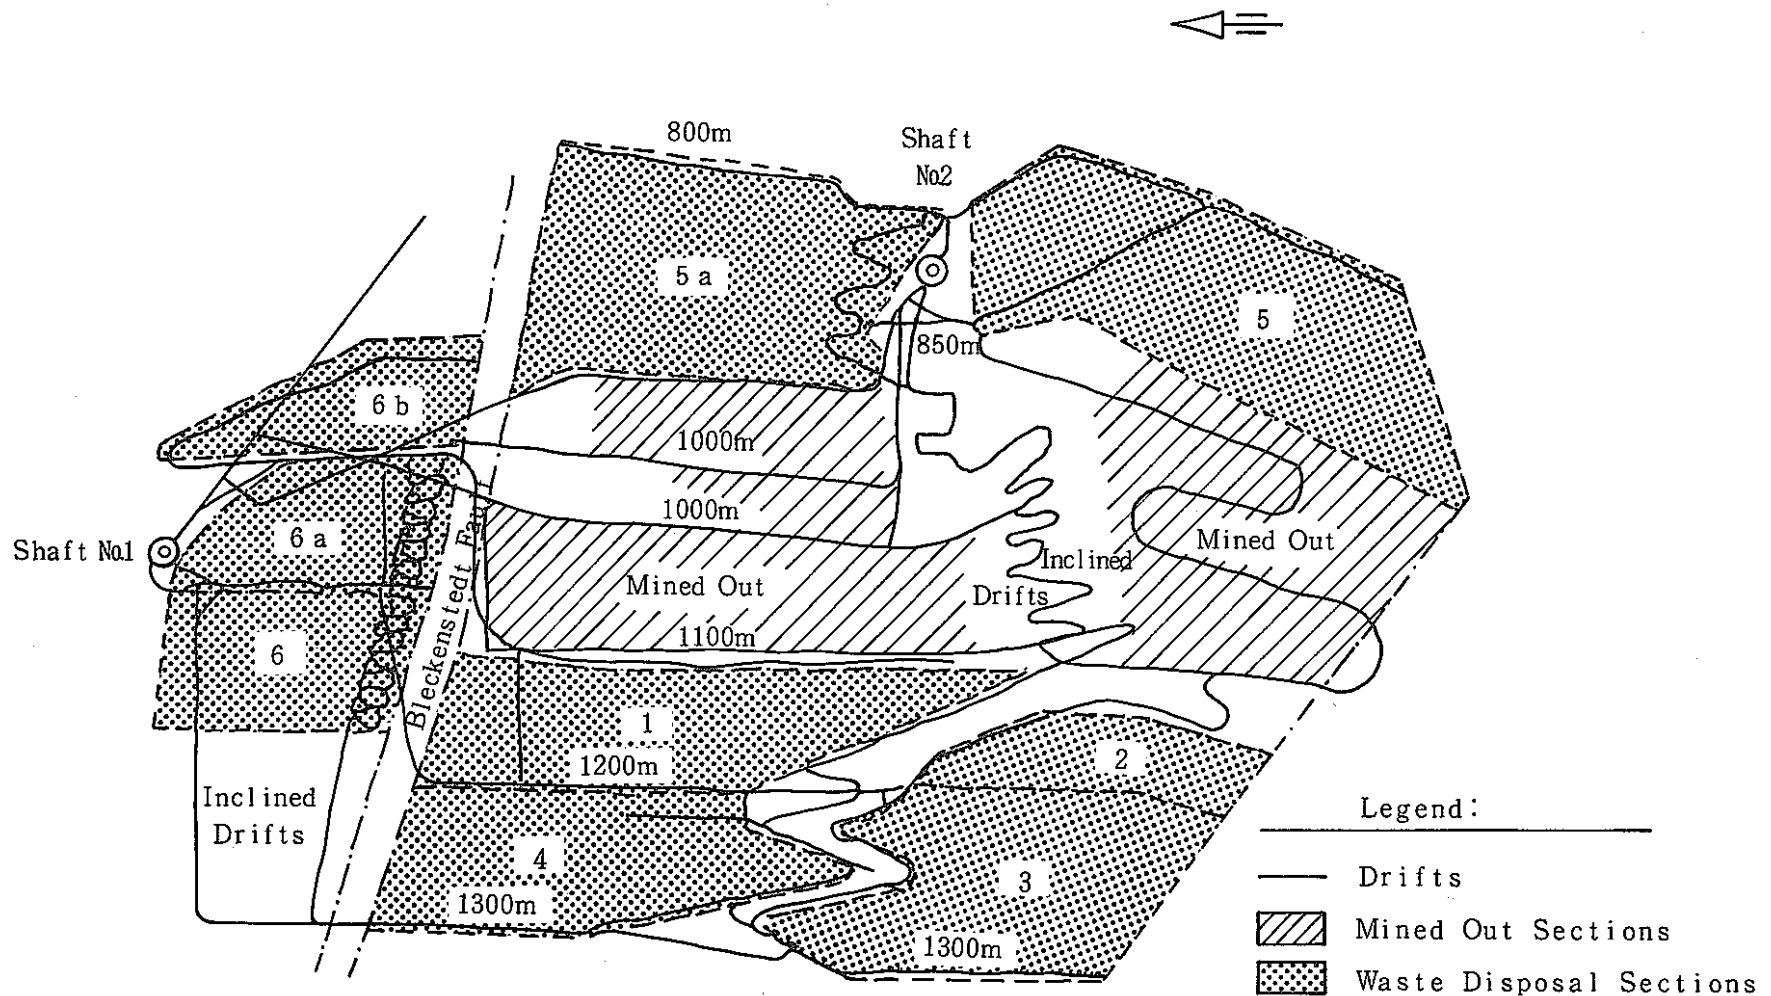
Konrad Mine Plan with Waste Disposal Sections
